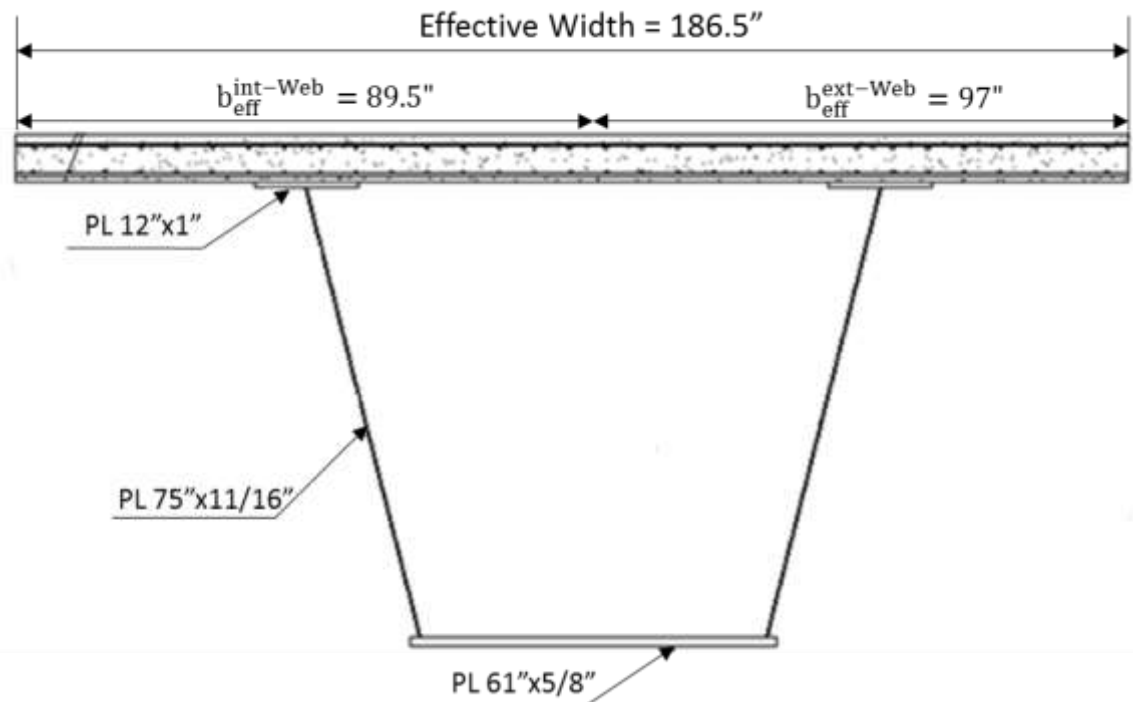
Box-girder composite section, Ft Lauderdale bridge.
